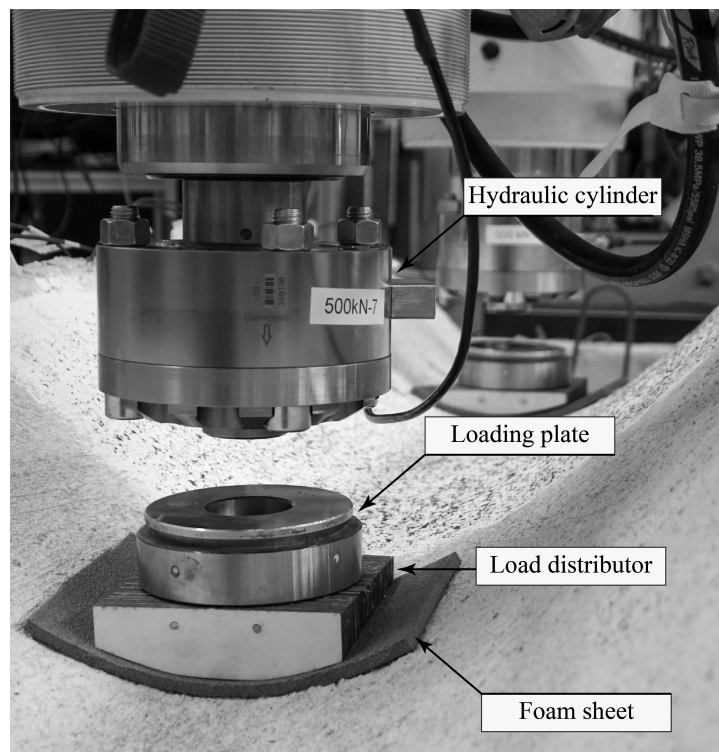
Application of concentrated loads (LC2). A plywood load distributor was positioned beneath each hydraulic cylinder. A thin foam layer was placed between the load distributors and the concrete surface to improve load transfer. The cylinders were positioned 900 mm apart.
